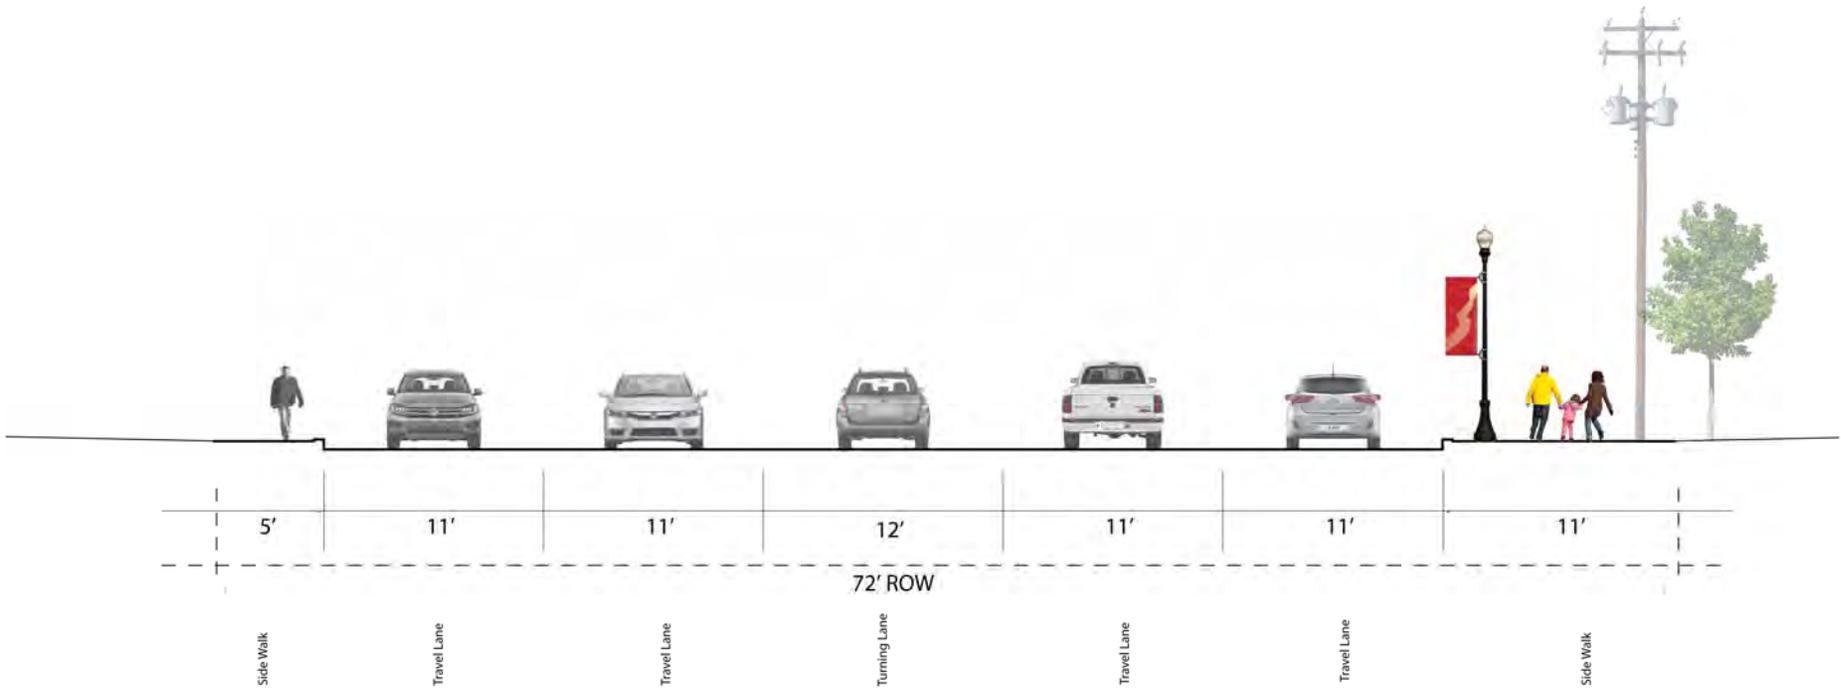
Broadway Cross-Section with Westerly Wide Sidewalk
